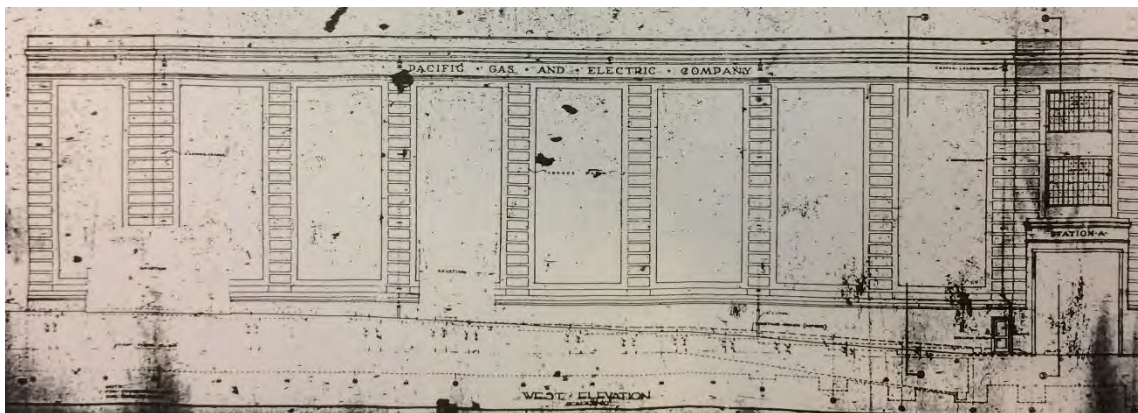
West elevation of Station A Switching Center (1930). Drawings by the PG&E Department of Engineering. Source: San Francisco Planning Department.
